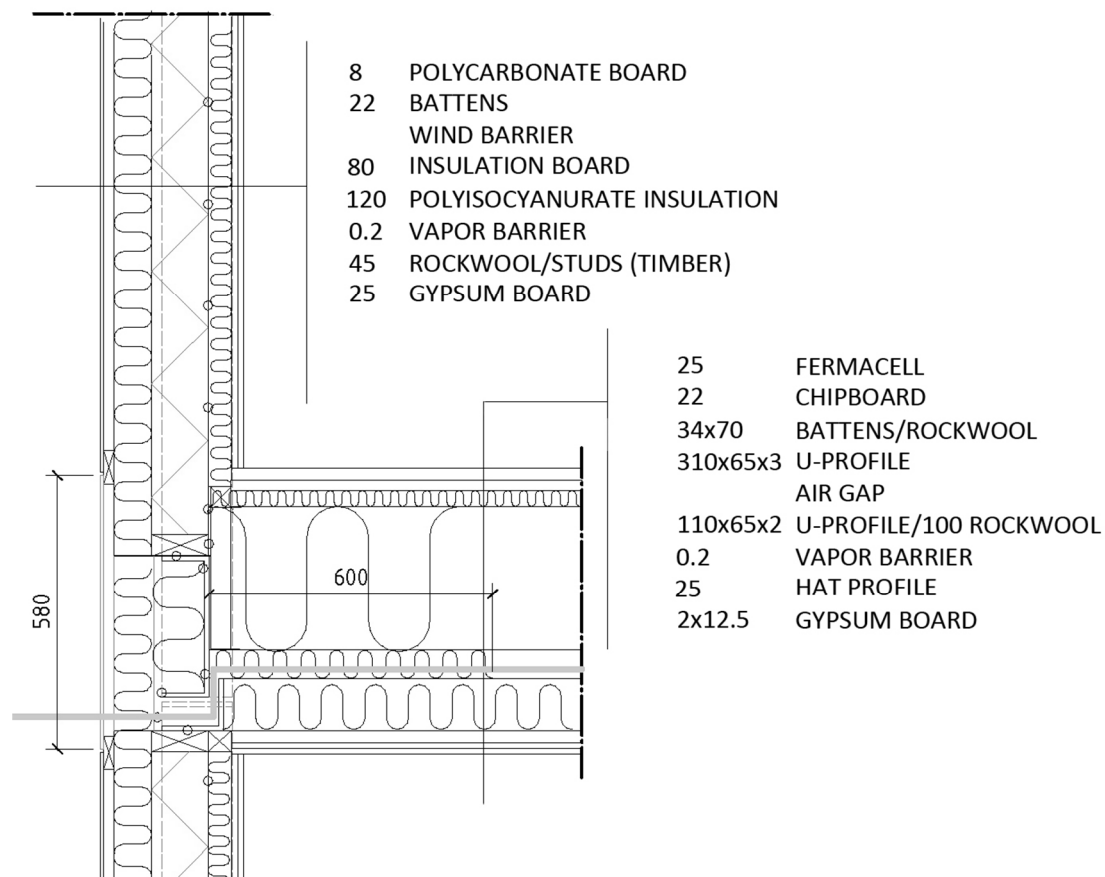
Section of the ordinary walls and floors in HSB Living Lab.
